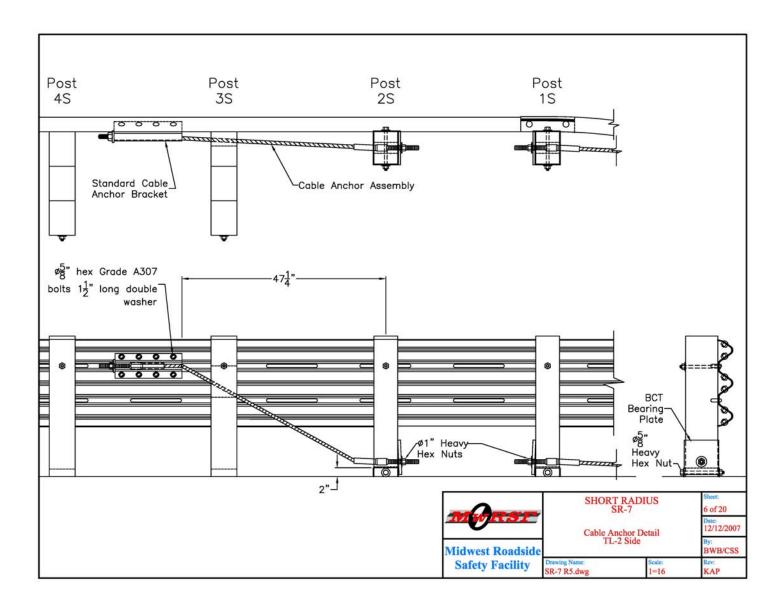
Cable Anchor Detail, Secondary Side (English)
